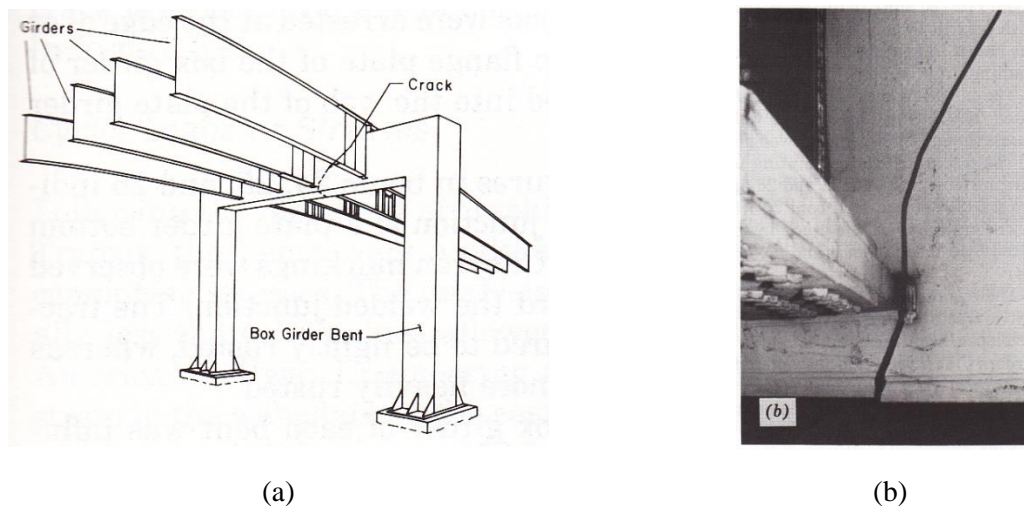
Fatigue cracks at the Dan Ryan railway viaduct (Fisher, 1984): (a) crack's typical location and (b) detail of the crack.
